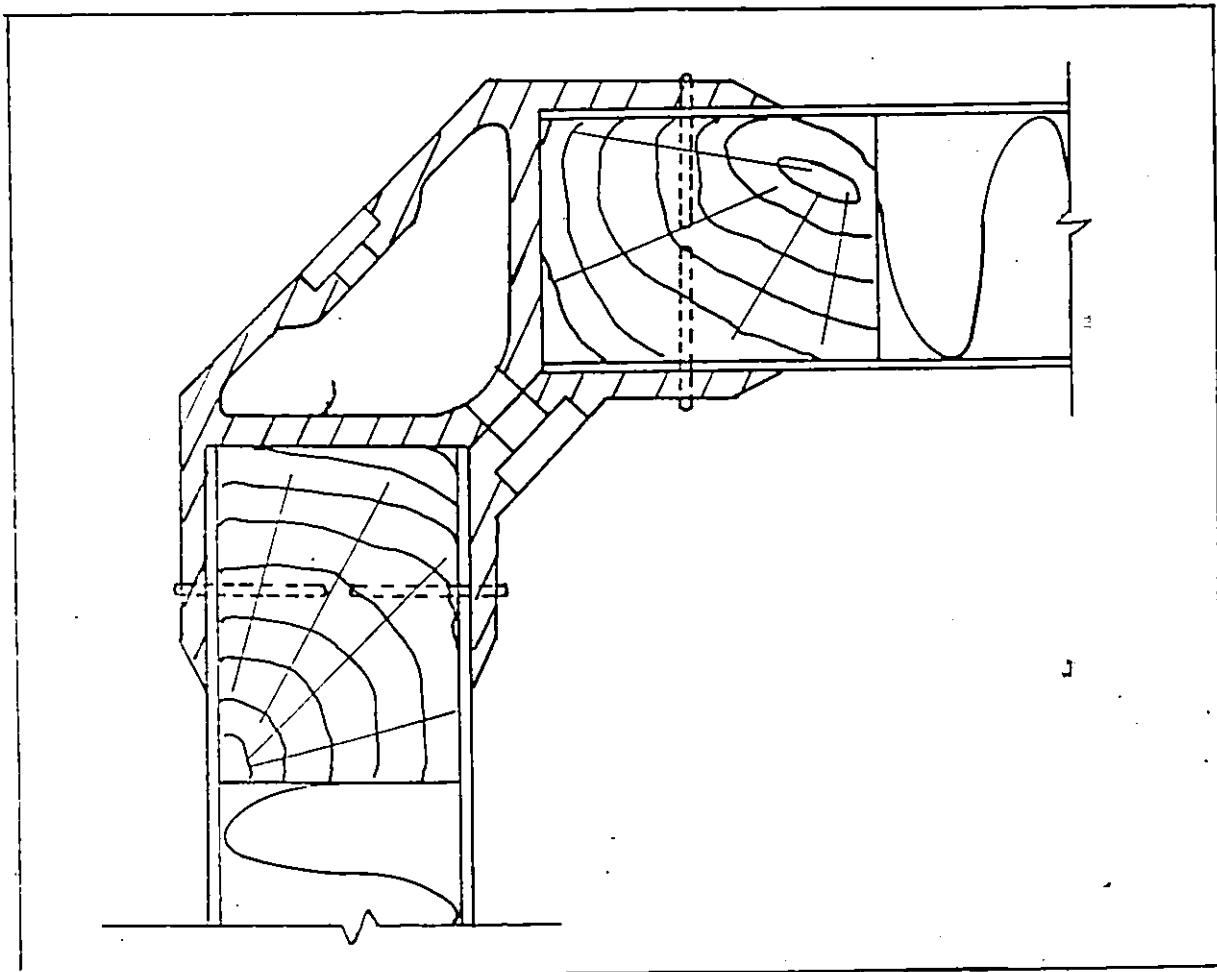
PROPOSED CONNECTION FOR TWO
